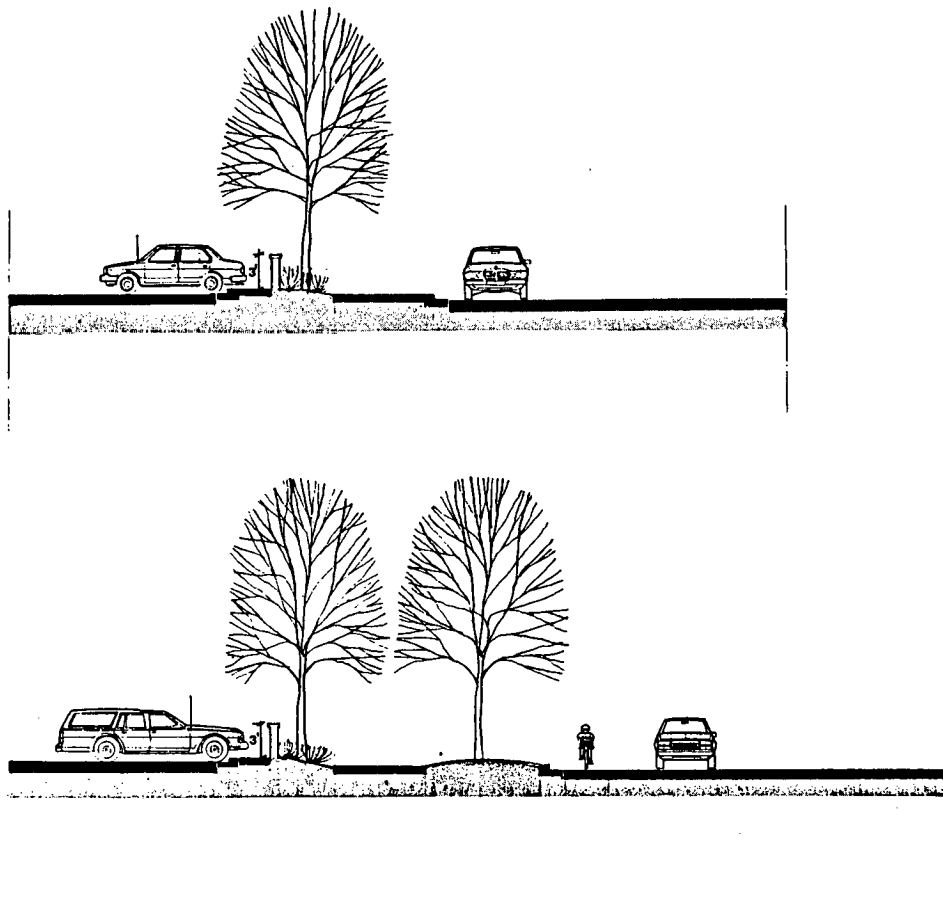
Alternatives for defining pedestrian space between the highway and developed property. (Source: Ref. 9)
